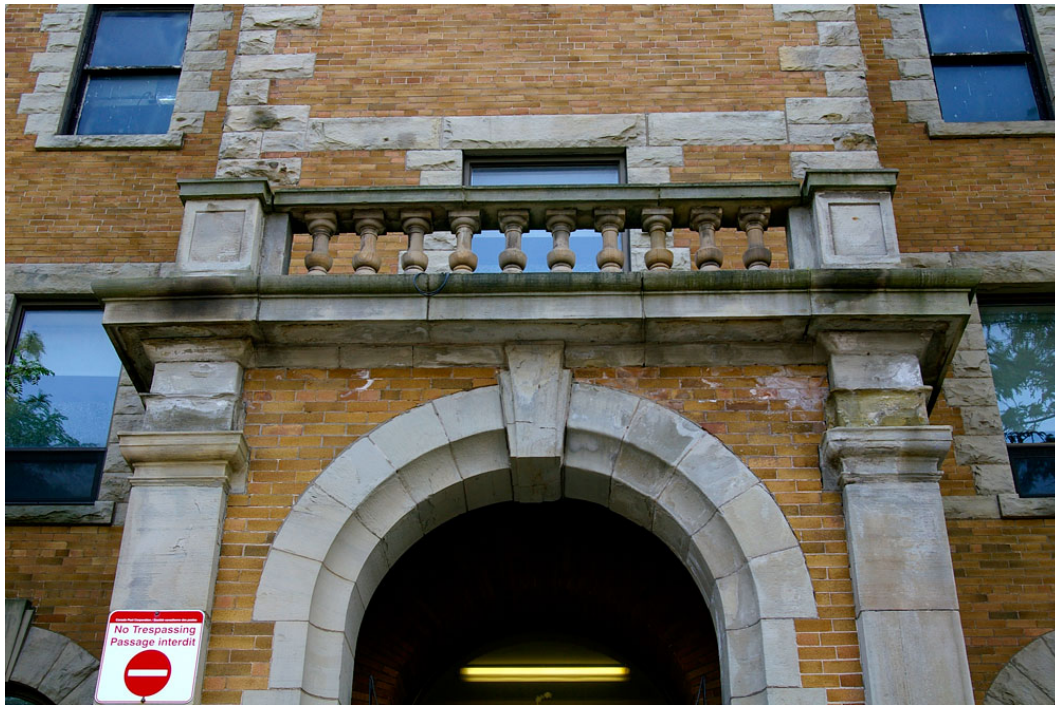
Close-up view of the upper half of the portico with its voussoir stone arch and prominent keystone, stone pilasters accentuating the corners, and decorative stone balustrade around three sides of the flat roof. Also shows some deterioration of the stonework at the top of the pilasters.
